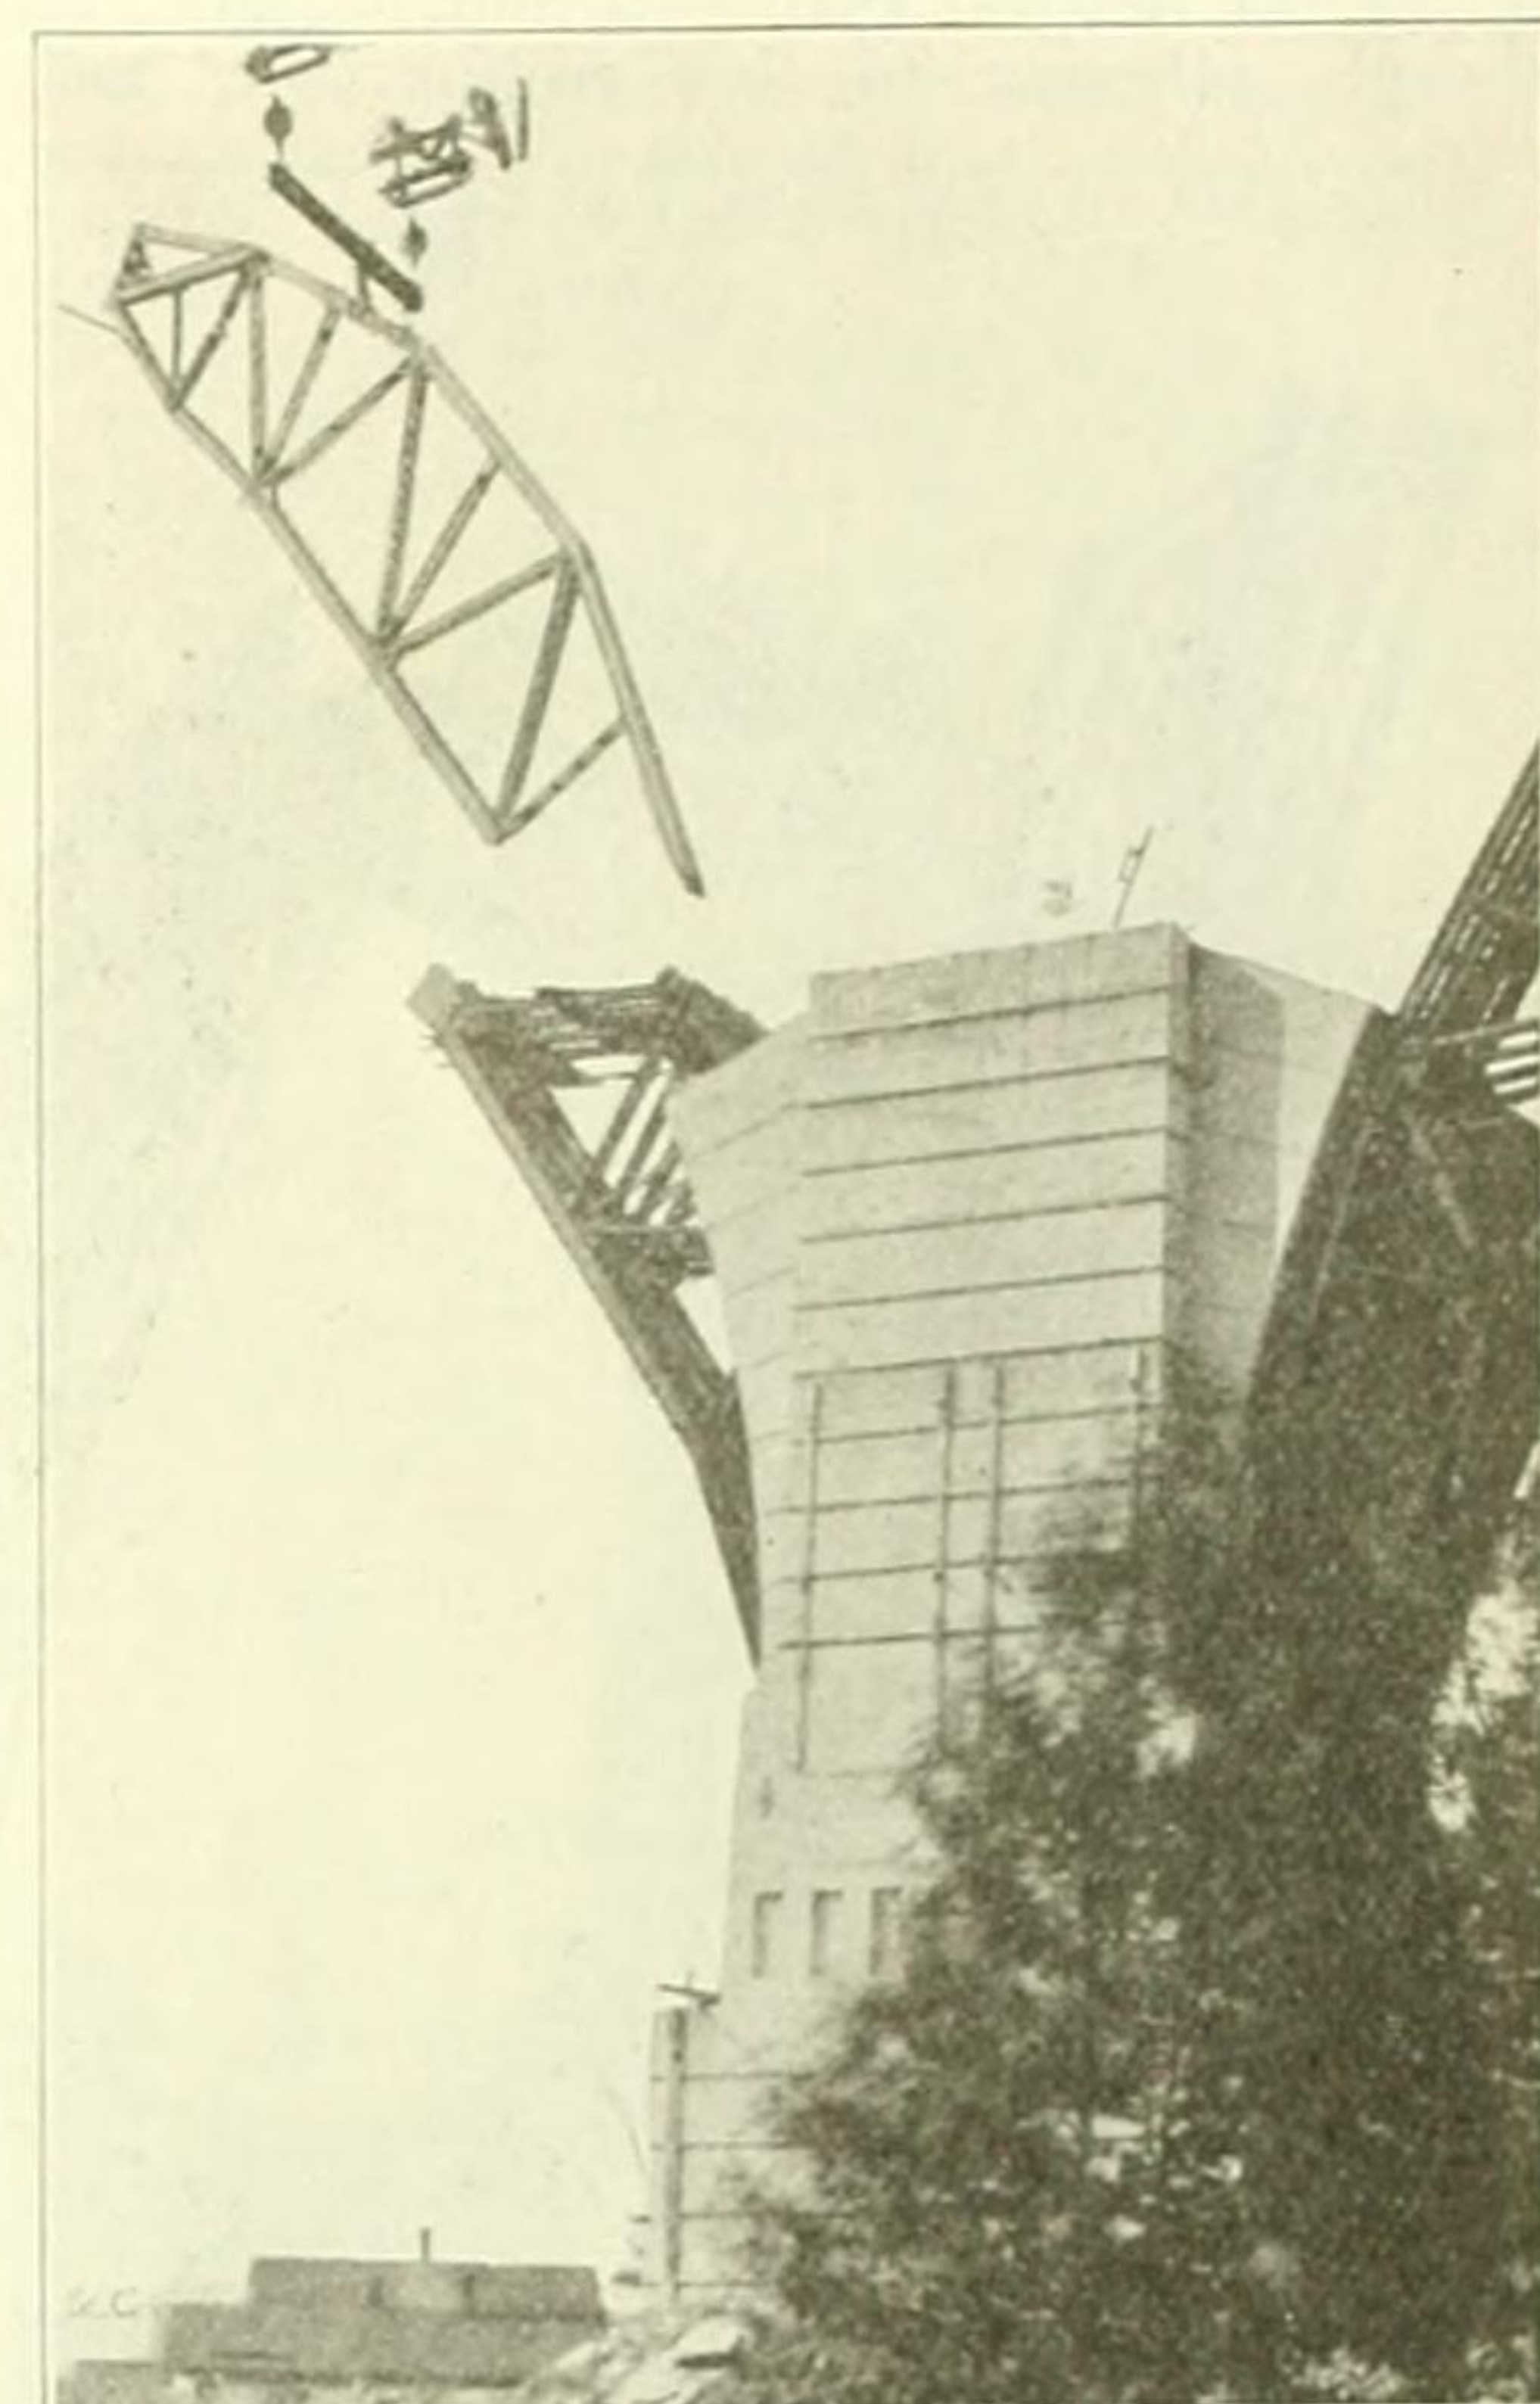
Erection of 180-Ft. Steel Centers for Intermediate Spans by Means of Cableway, Tunkhannock Creek Viaduct.
